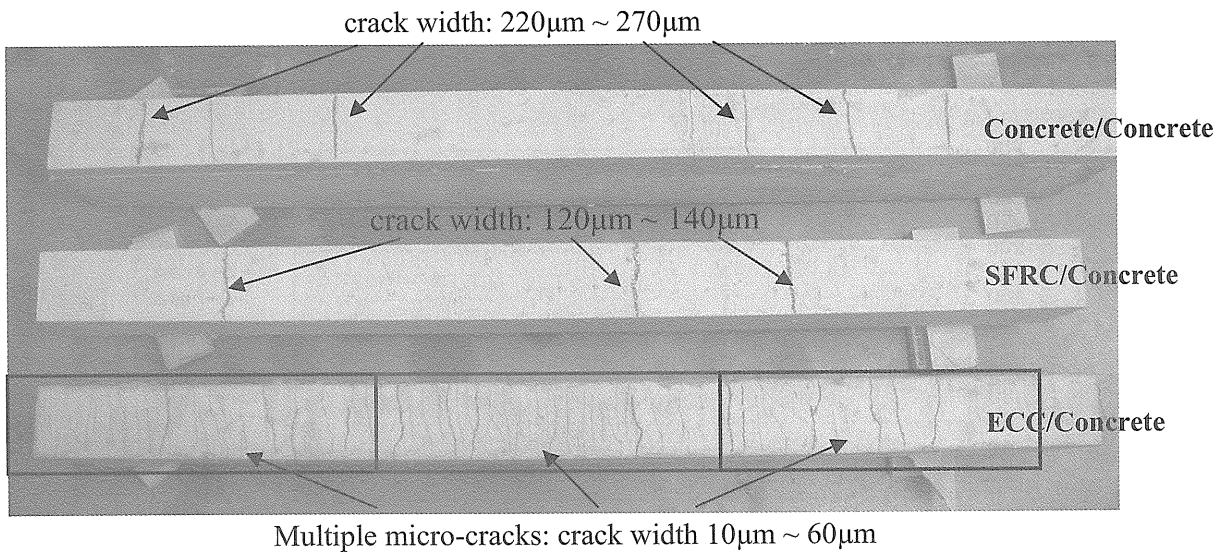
Surface crack pattern of different layered repair systems based on concrete, SFRC and ECC (concrete substrate surfaces roughened to 7~8mm)
